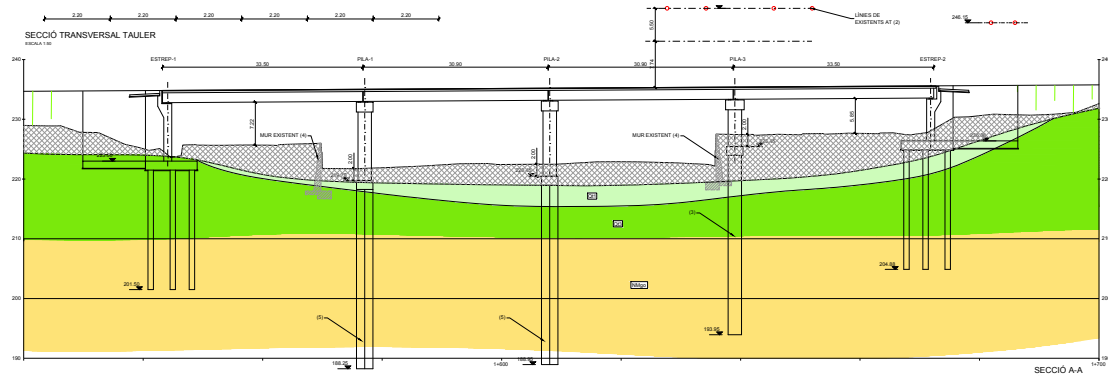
“Las Arenas Viaduct”, frontal view elevation.
